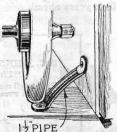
Heavy pipe fastened across corners prevents car scraping garage door
